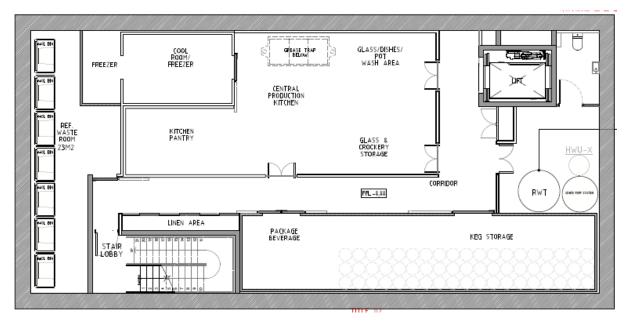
Basement Level 02 (source: application plans prepared by Point Architects)
